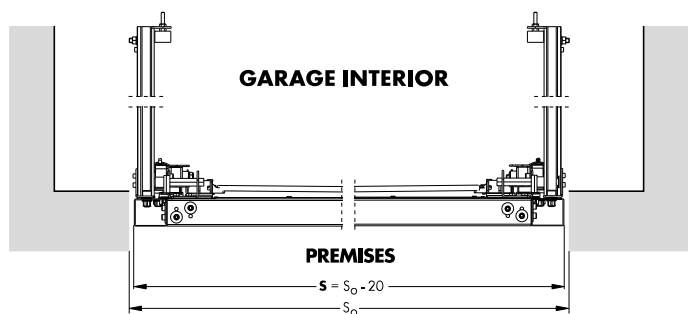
Installation in the opening (horizontal section) of Komfort, Select, Connect
